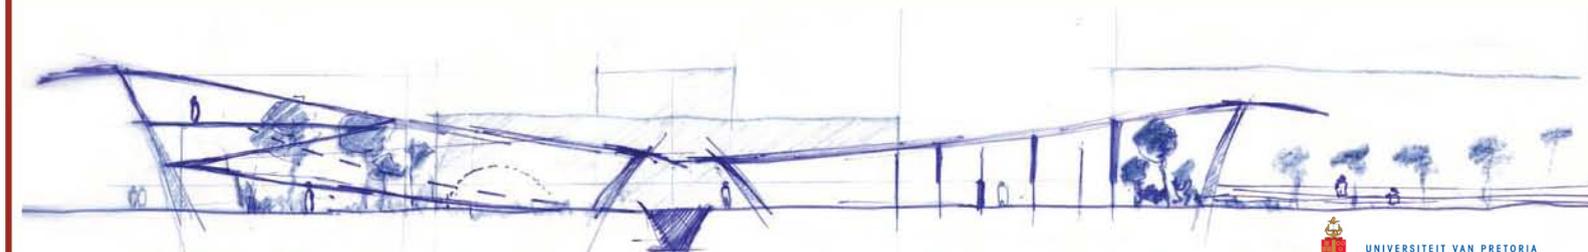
Roof structure drapes over sections of the garden and research functions. Users can move up over the building via r
